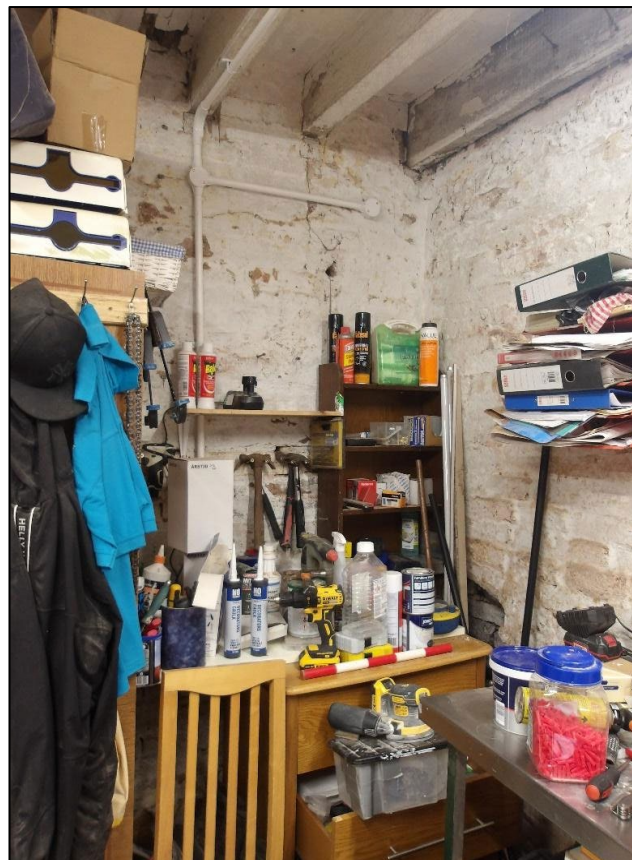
Coach house, ground floor interior. View northwest. 0.5m scale
